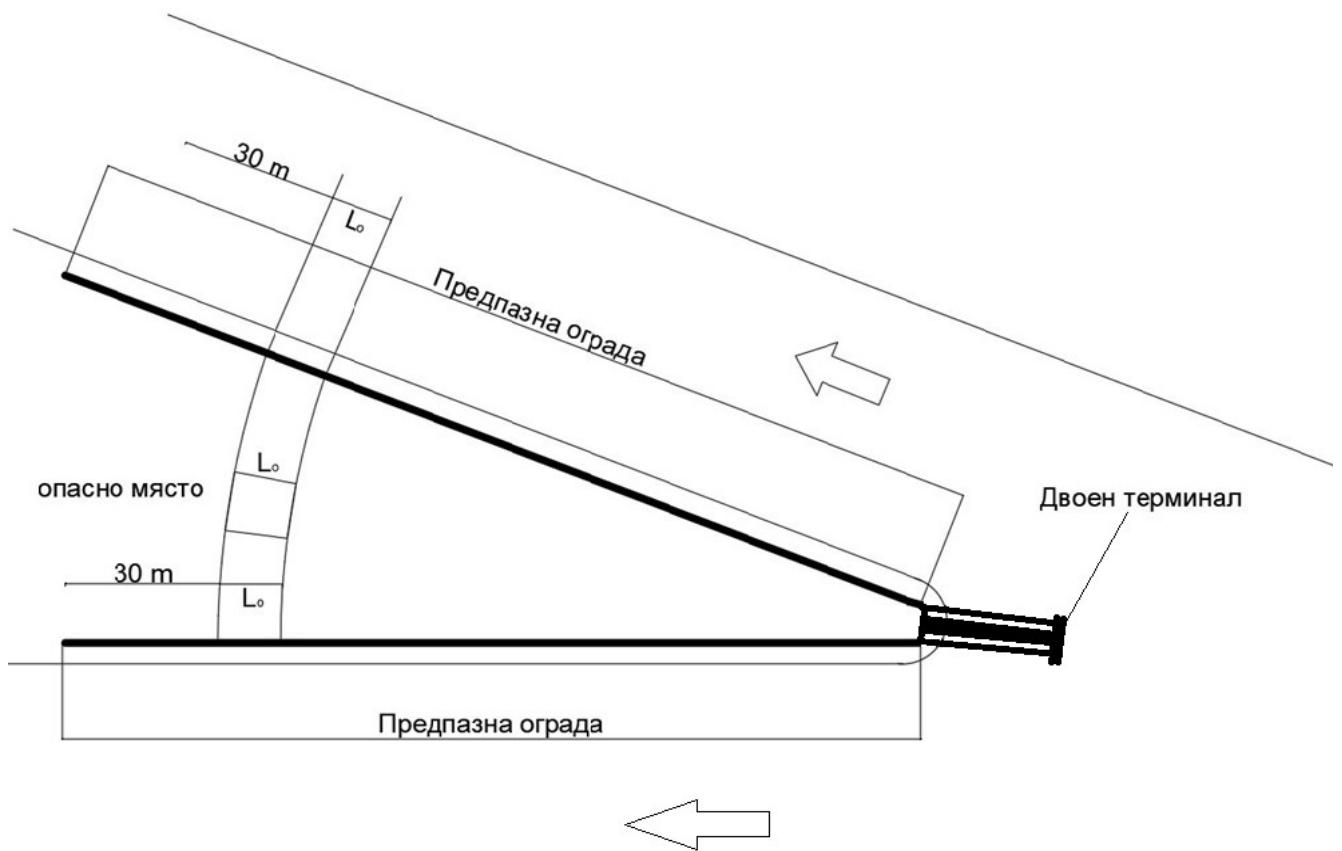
Top of a dividing island with safety barriers in both directions and elements to start a double terminal
